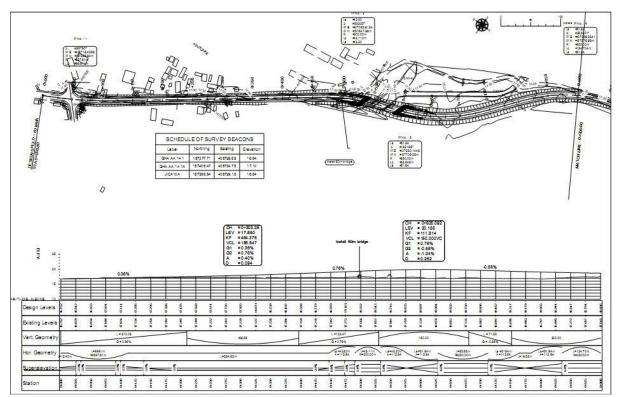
Sample Plan and Profile of Asutuare – Aveyime Road (Section 2 Project Road)
